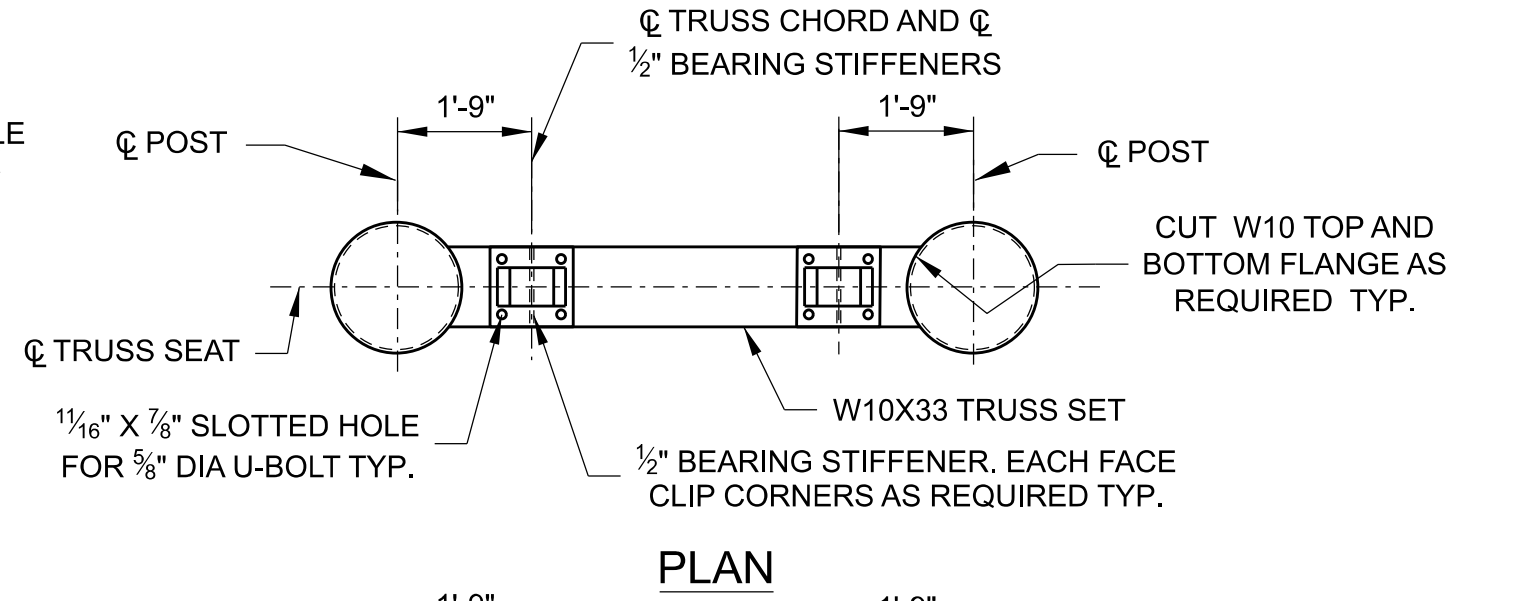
DETAIL A AET EQUIPMENT TO TRUSS CONNECTION DETAILS SCALE 1" = 1'-0"
